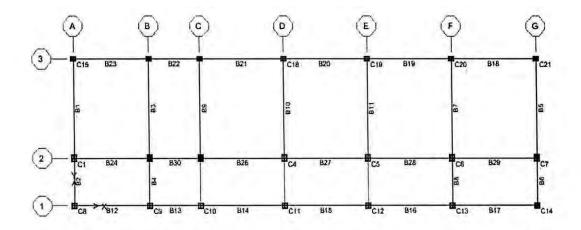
Plan of a CDSP-2 type cyclone shelter
